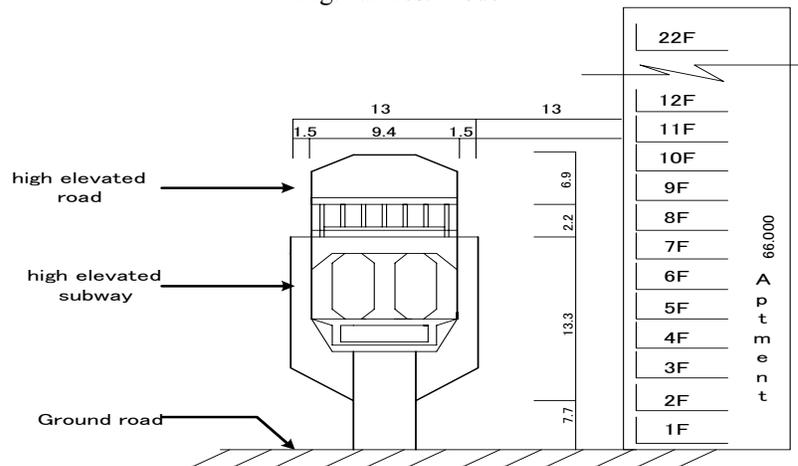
Section of High-Elevated Structure by Apartment, unit: m
